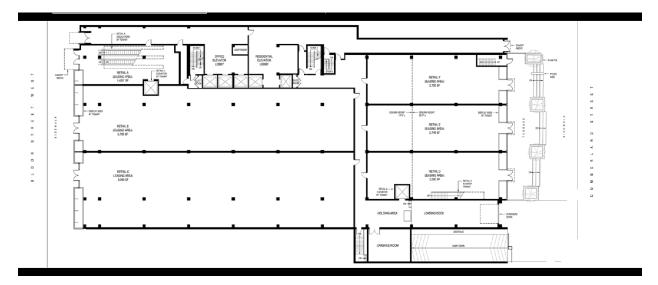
Ground Floor Layout Plan of the Mixed-Use Complex
